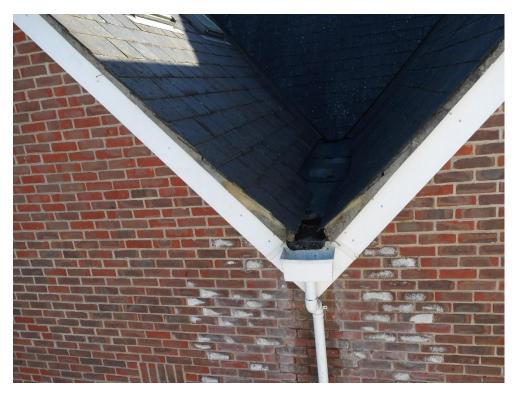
View of hopper and downpipe feature to the side elevation. With staining to the exterior of the property.
